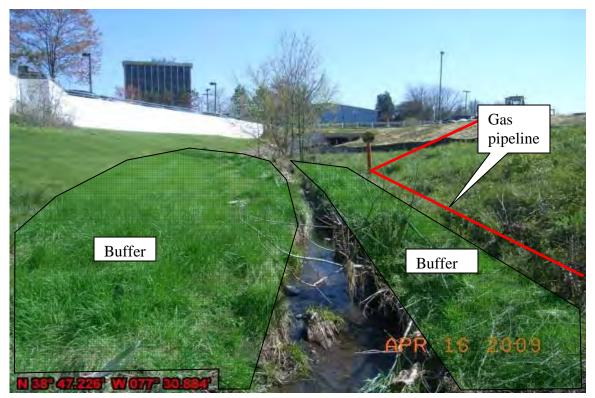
Downstream of recently constructed bridge with proposed buffer.
